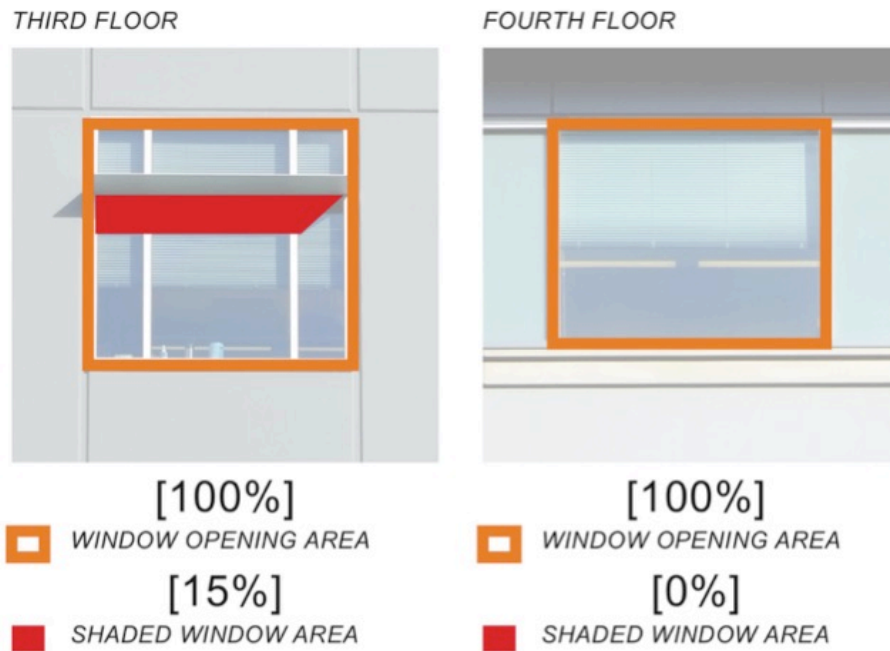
Seasonal exterior shading factors of third floor (left) and fourth floor (right) fenestration design, shown on October 20, 2014 (not to scale).
